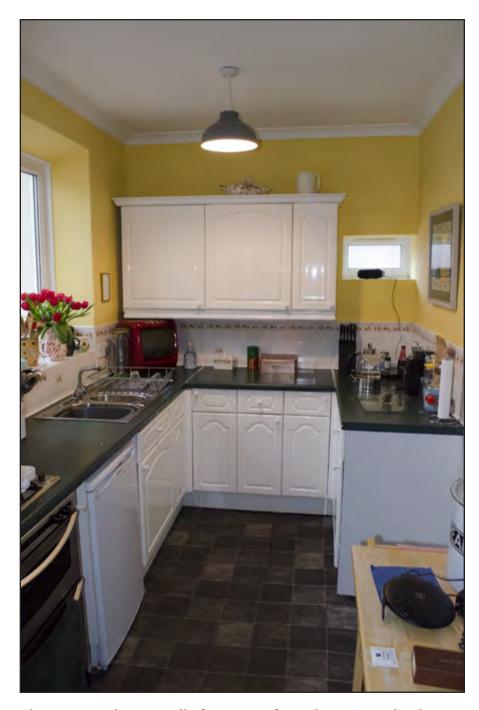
Northwest wall of property from the existing kitchen; scale not used; (archive reference: G2738_020).
